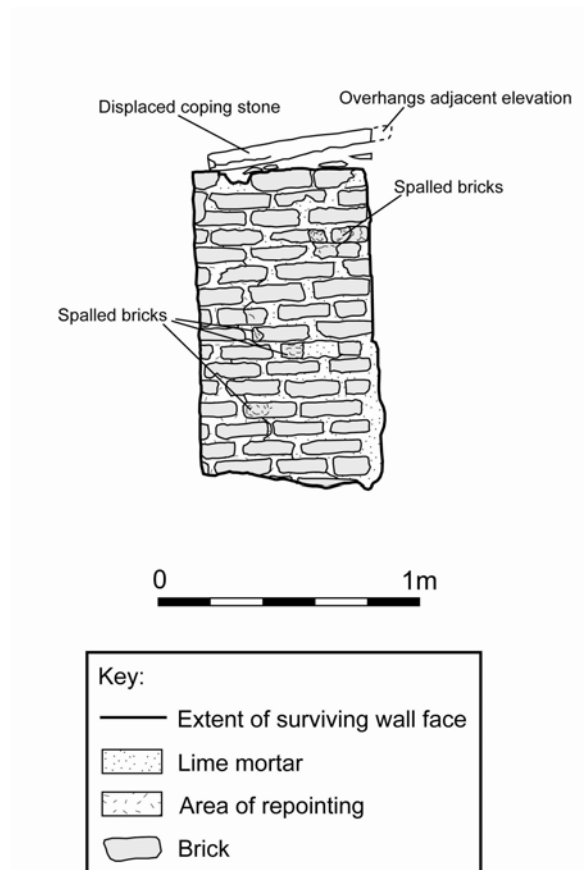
Structure 1, West Stair: Elevation e (South-facing revetment)
